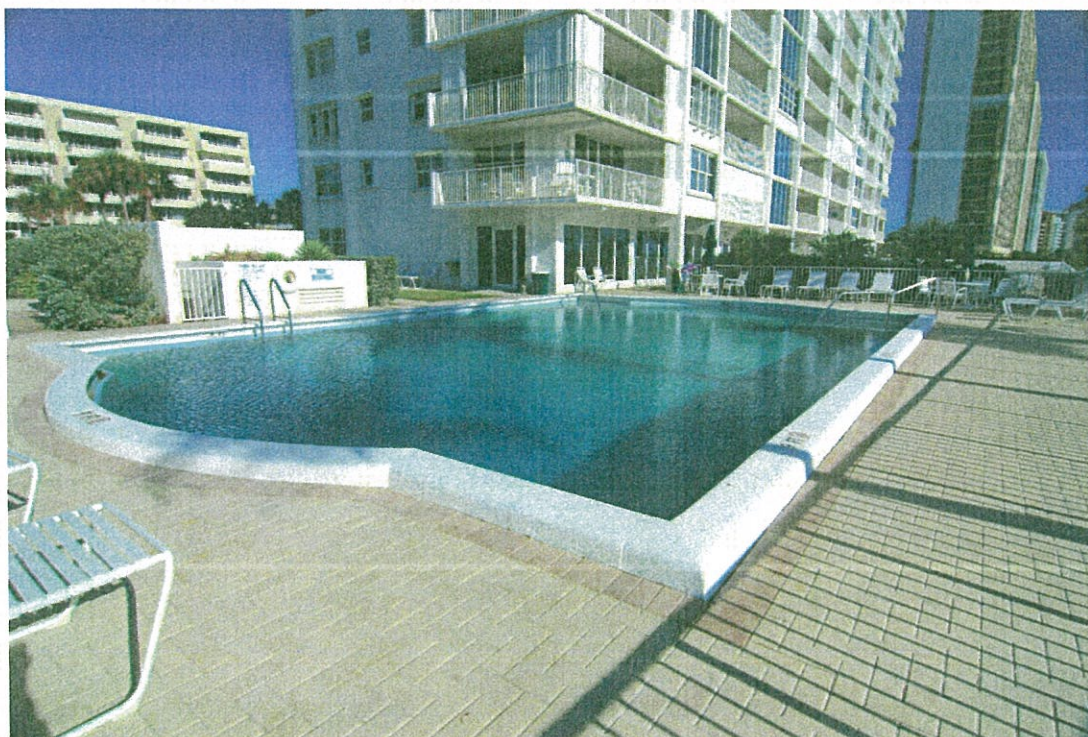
OVERALL VIEW OF POOL AND DECK LOOKING NORTHWEST
